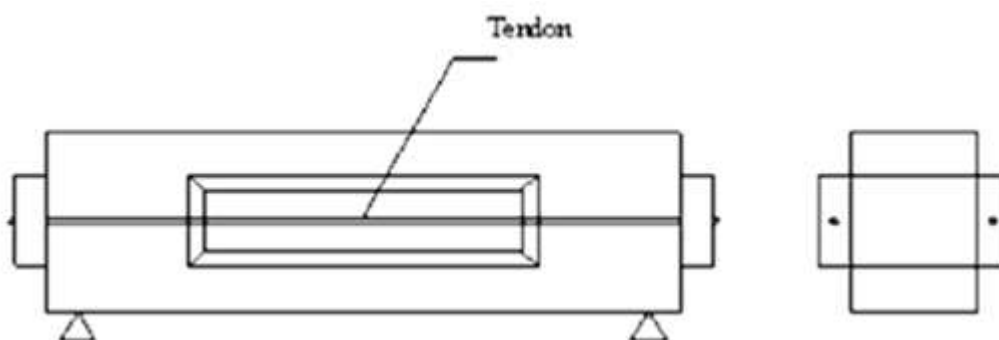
Anchoring of external prestressing at the ends. (Chen,S., 2005)
